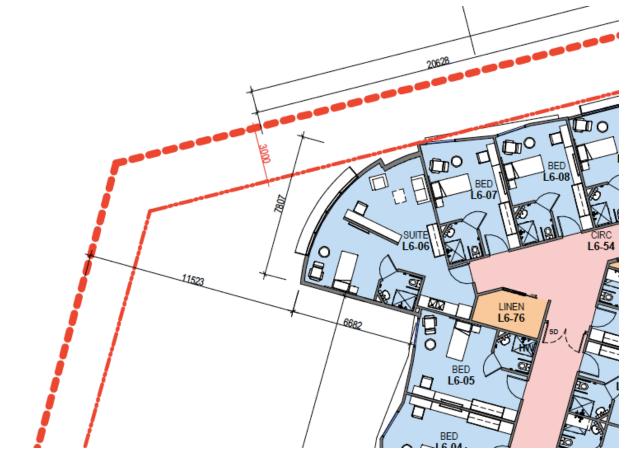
Extract of Level 6 plan showing setbacks in south west corner of site (Source: MDPA)
